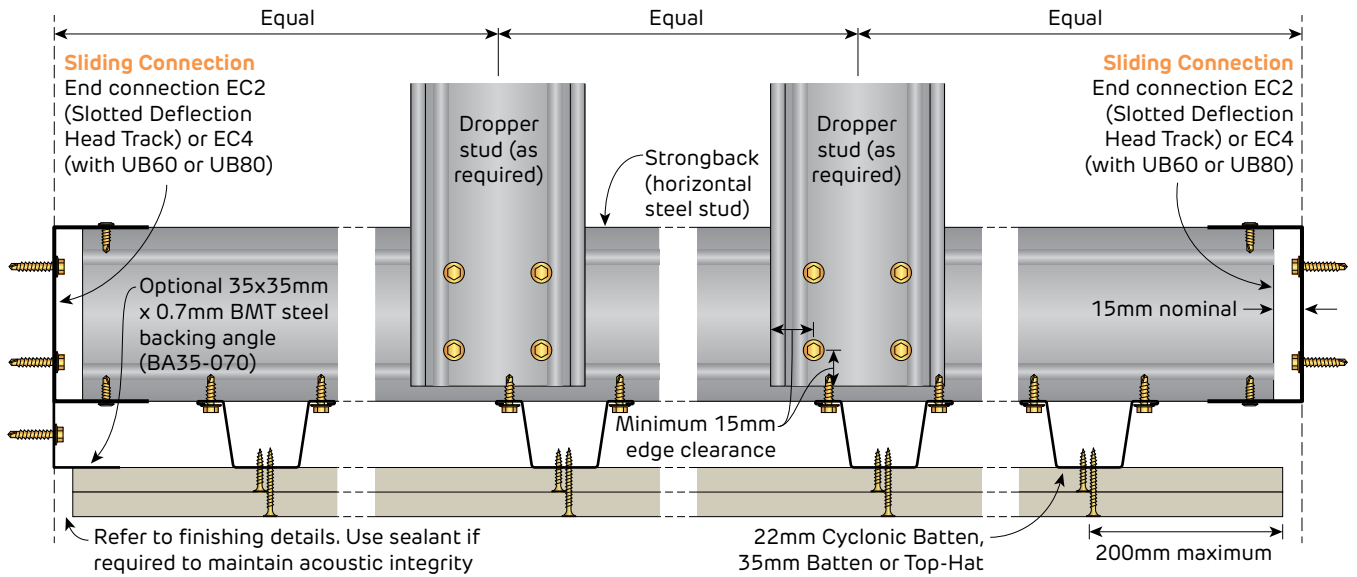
Stud Ceiling Type C2 - 2-way Plenum Braced
